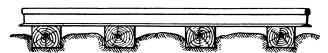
Longitudinal Section of Track on New Grade After Being Used by Construction Trains.
